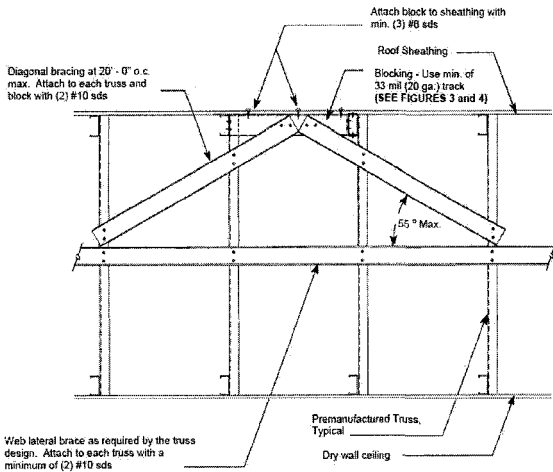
Web Lateral and Diagonal Bracing (LGSEA 1998b)
